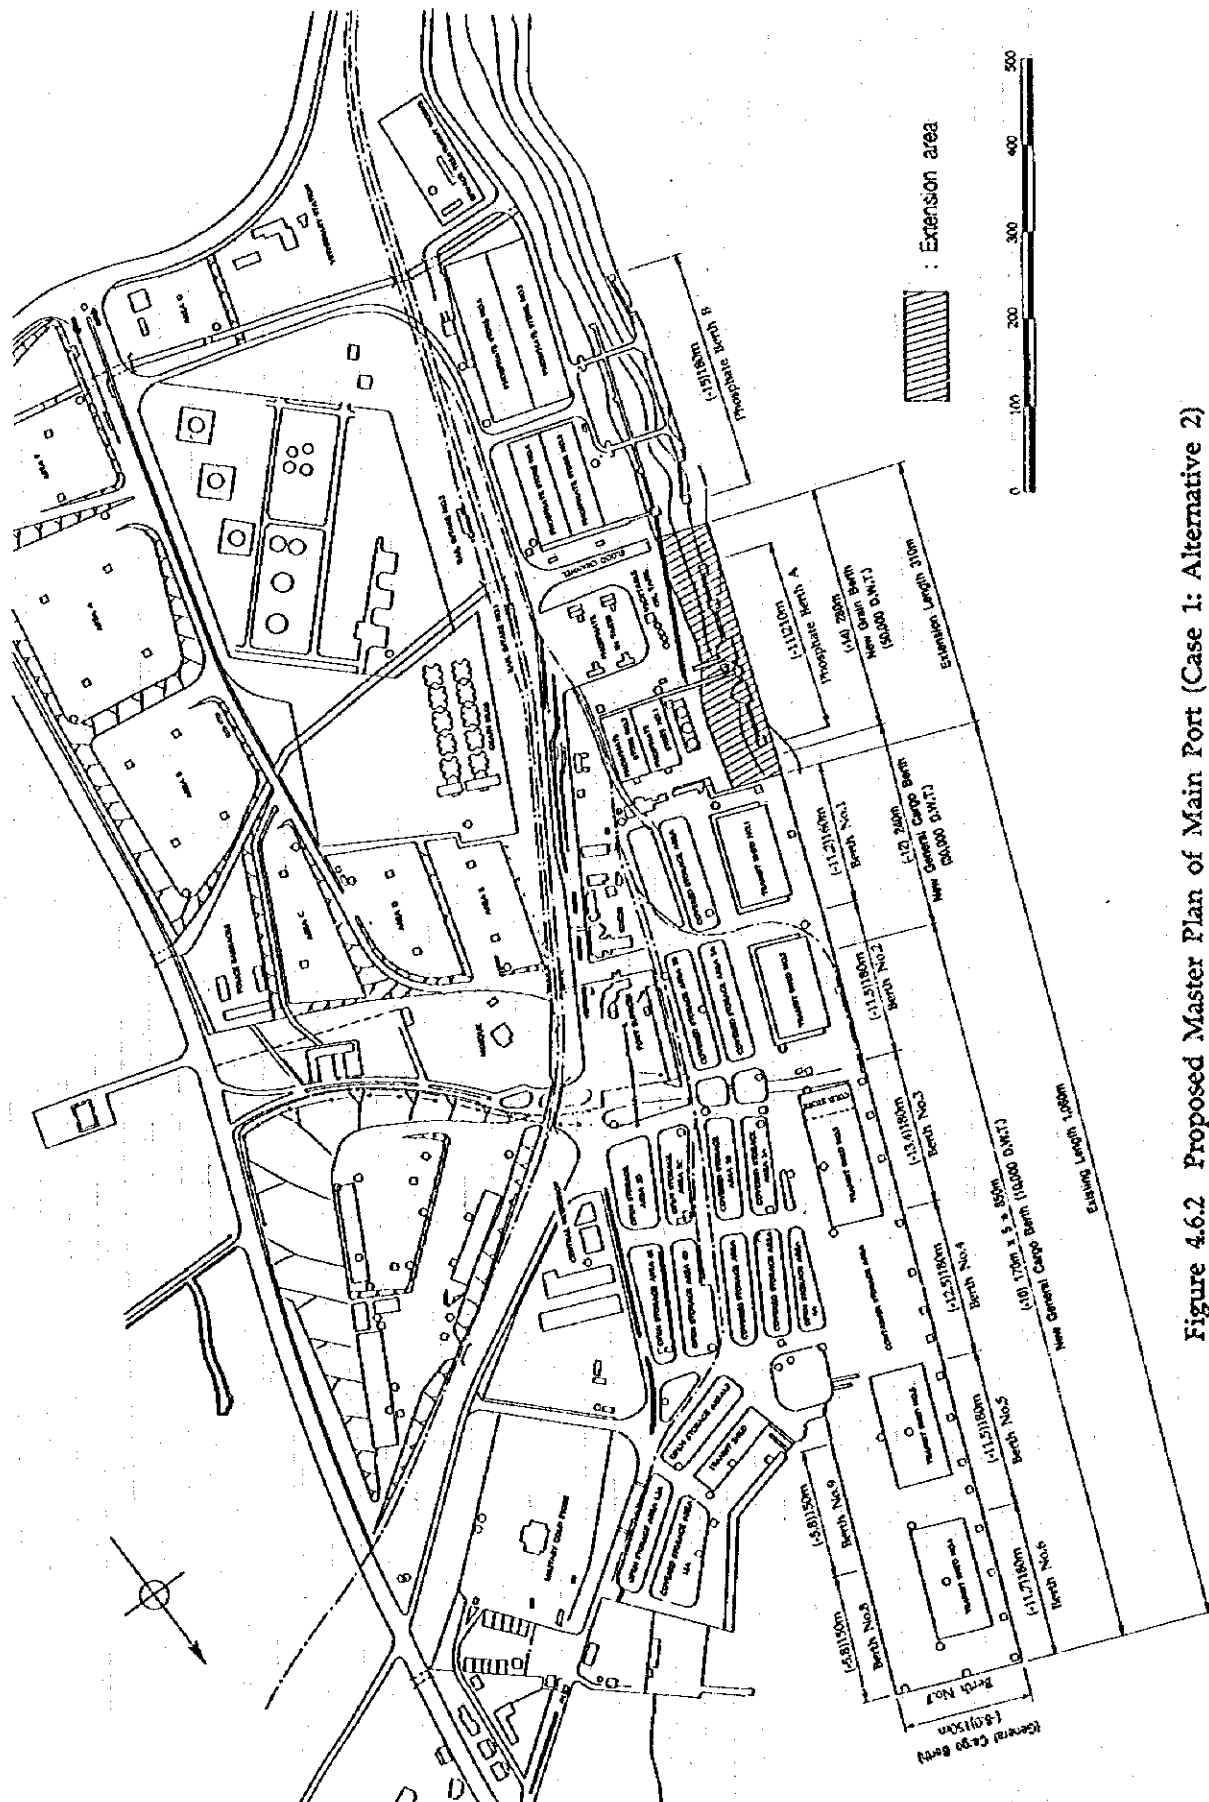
Proposed Master Plan of Main Port (Case 1: Alternative 2)
